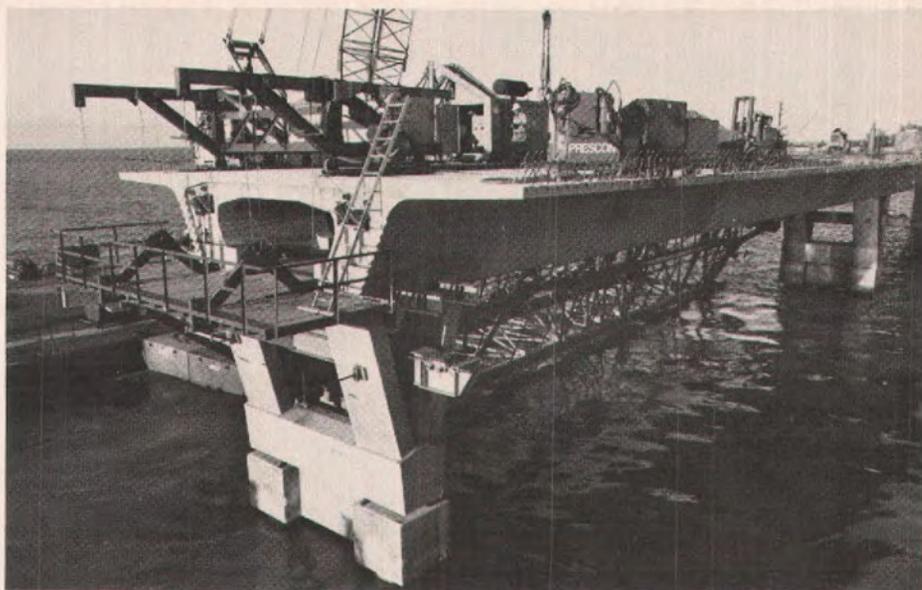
(a). Span-by-span technique using movable steel truss (Long Key Bridge).
